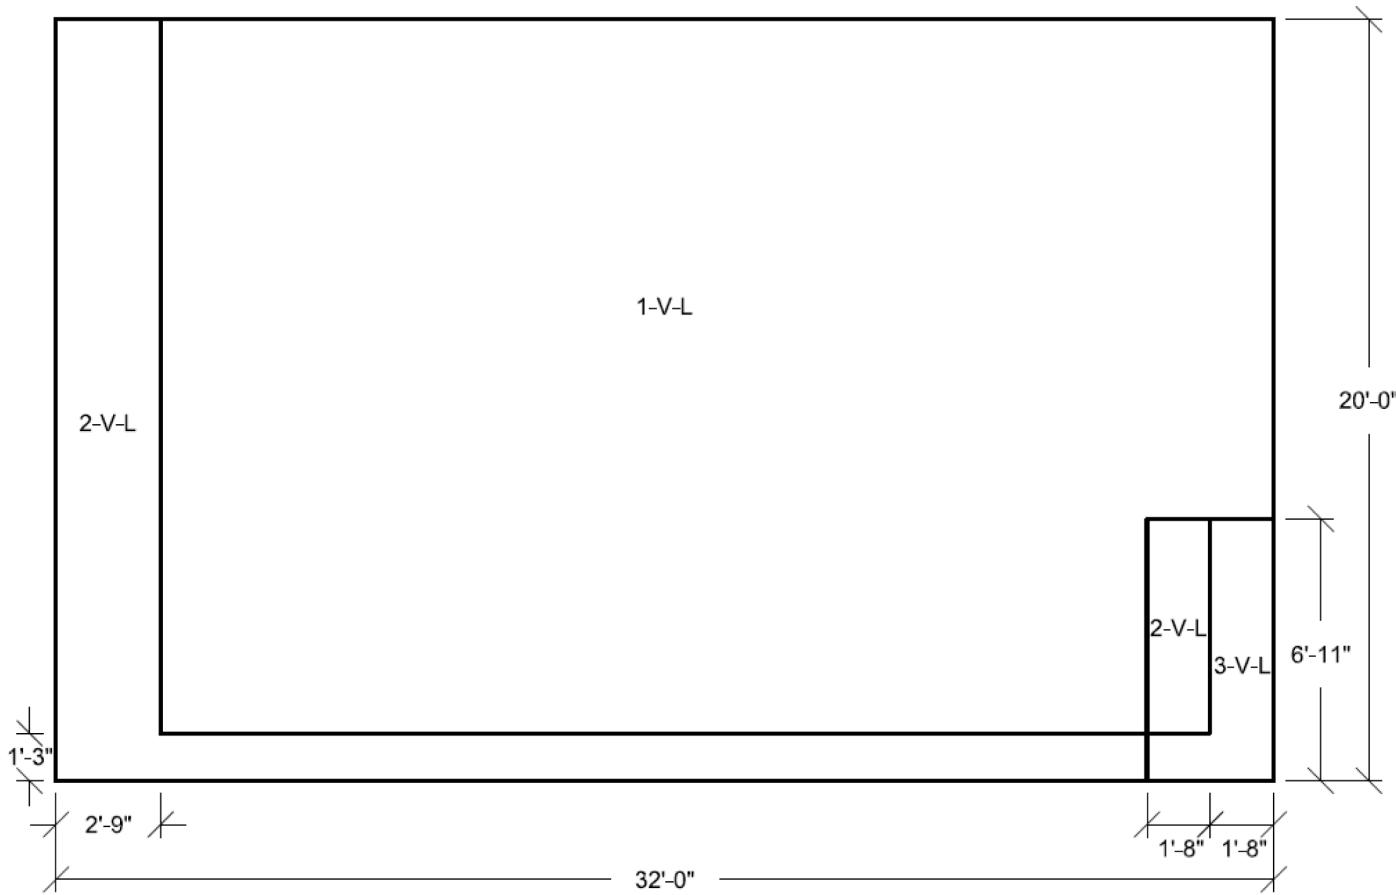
H.6-195 DGFOSV Wall 14 Looking From Outside
